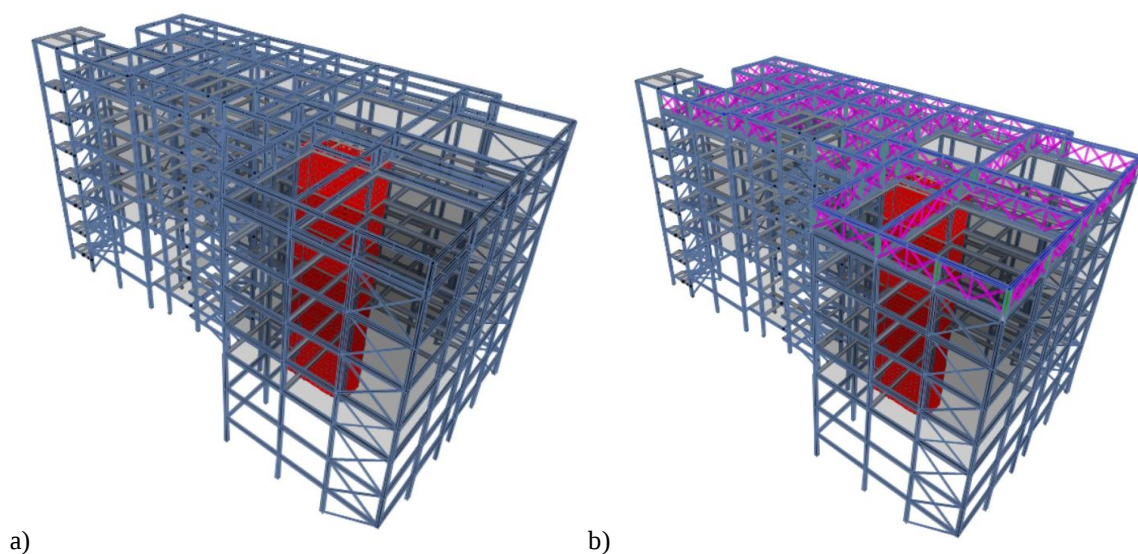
Structural Model. a) As-built building; b) Retrofitted Building.
